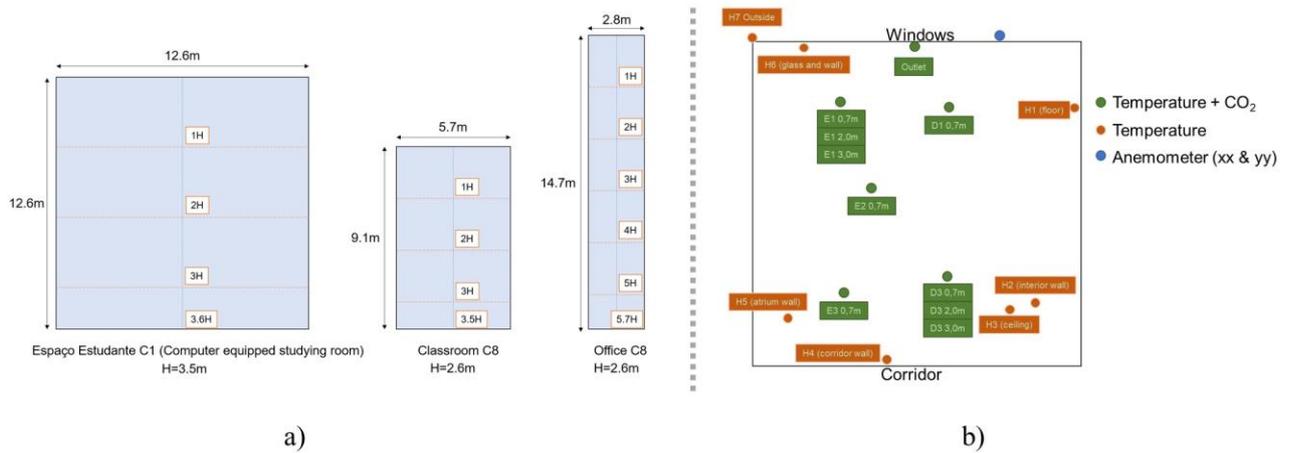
a) room floorplans with depth shown in floor to ceiling heights, b) schematics of the measurement setup used in room C1.
